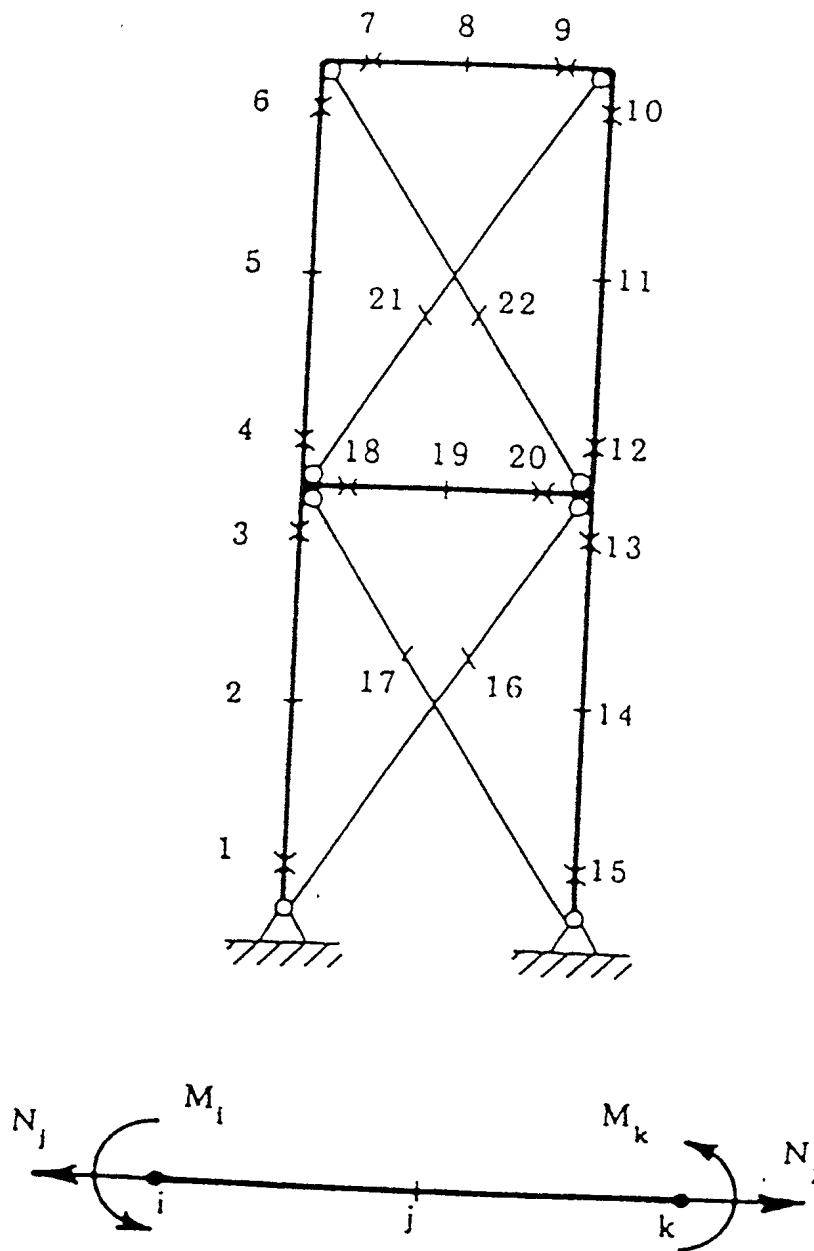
Failure Elements and Section Forces for the Two-Storey Braced Frame
